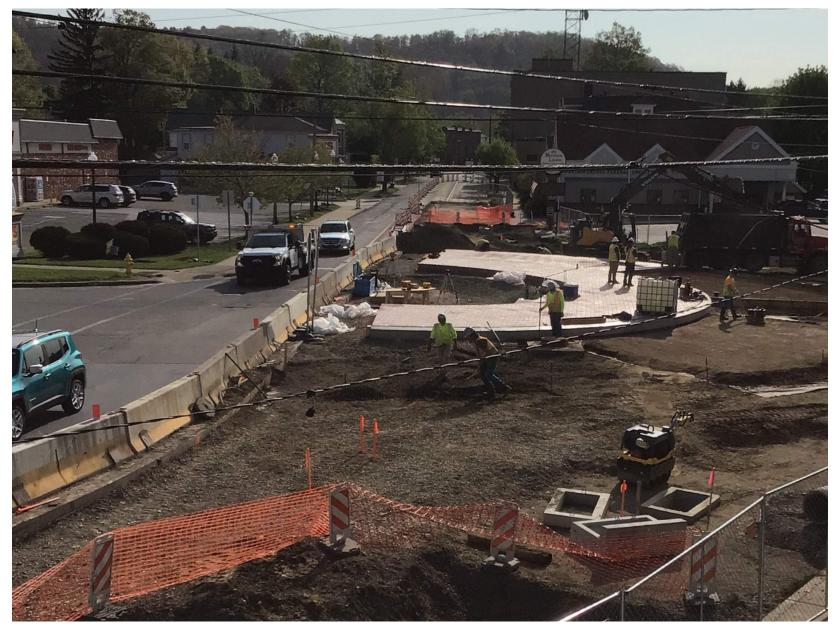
Staged Construction, Looking East (Photo by PennDOT)
